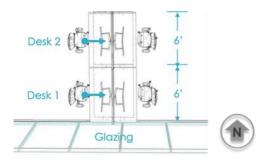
Seating Configuration used for analysis. The model assumes a 10' ceiling with floor to ceiling glazing.
